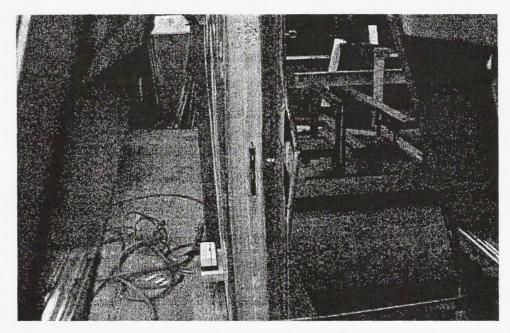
Failure of 8' Galv.-Galv. Panel Under Compressive Loading
